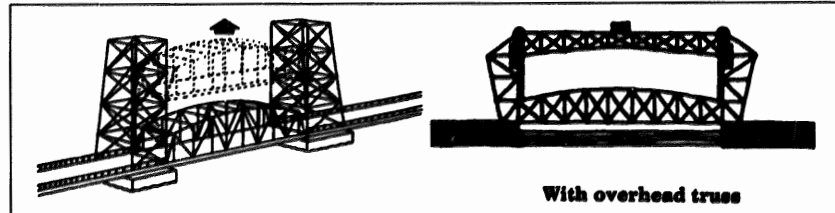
Two examples of lift bridges, note the massive towers on both bridges. The bridge on the right has an additional overhead truss which serves to strengthen the towers.
